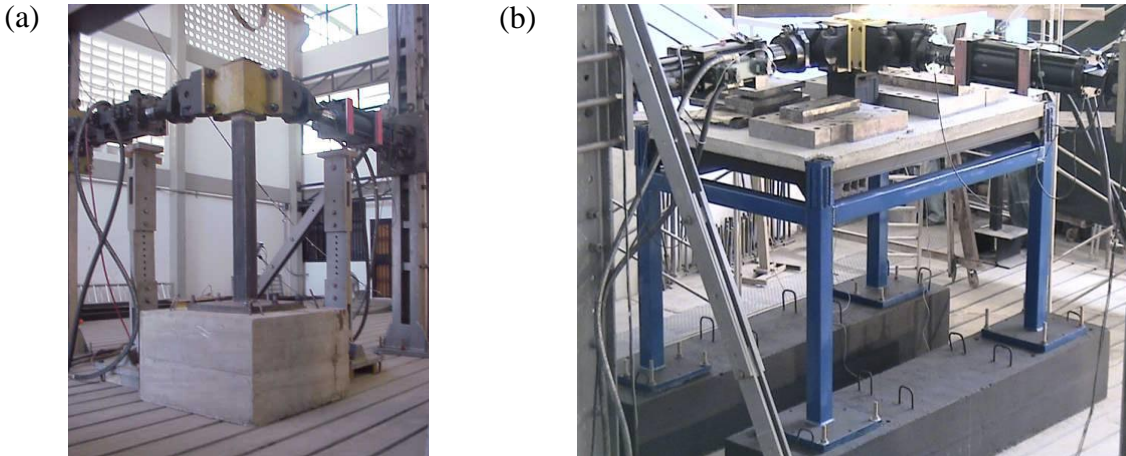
(a) Setup of the cantilever specimen test. (b) Setup of the tridimensional frame test.
